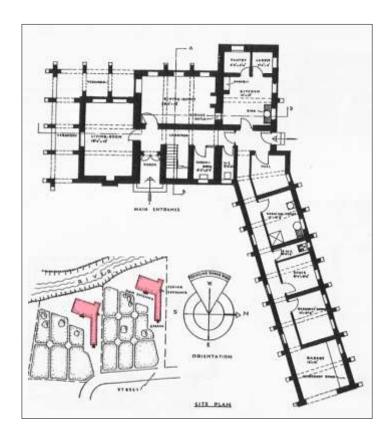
10: Ground floor plan of 2-bedroom Official Residence (Macartney, 1943).
